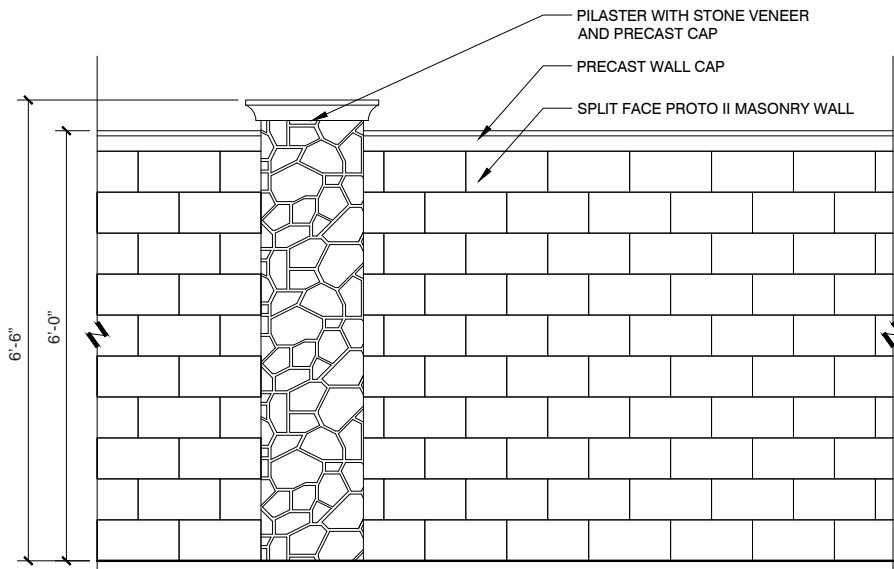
Conceptual Masonry Privacy Wall Detail
